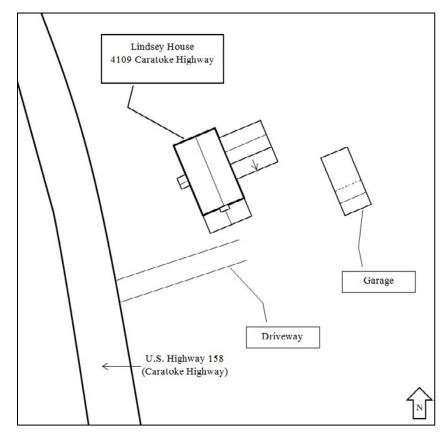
Site Plan for the Lindsey House, Not Drawn to Scale
